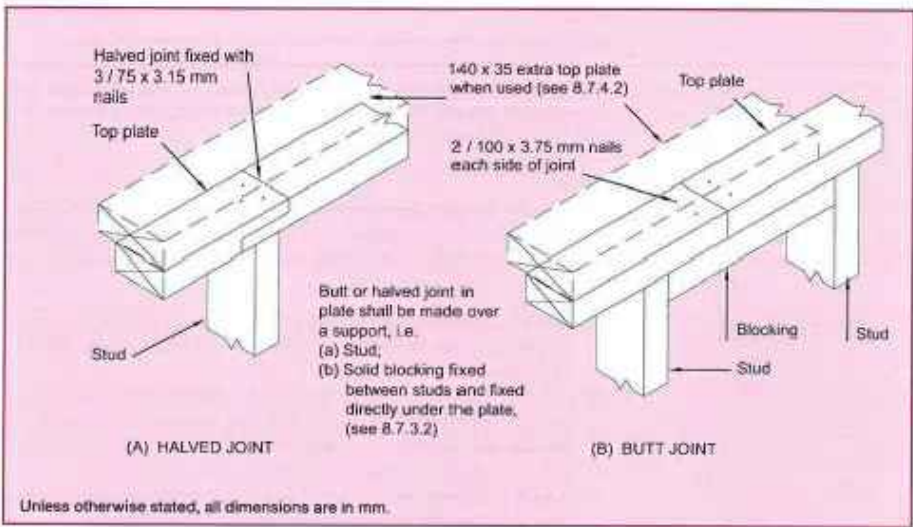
Connecting top plates – Walls not containing bracing (see 8.7.3.2)
